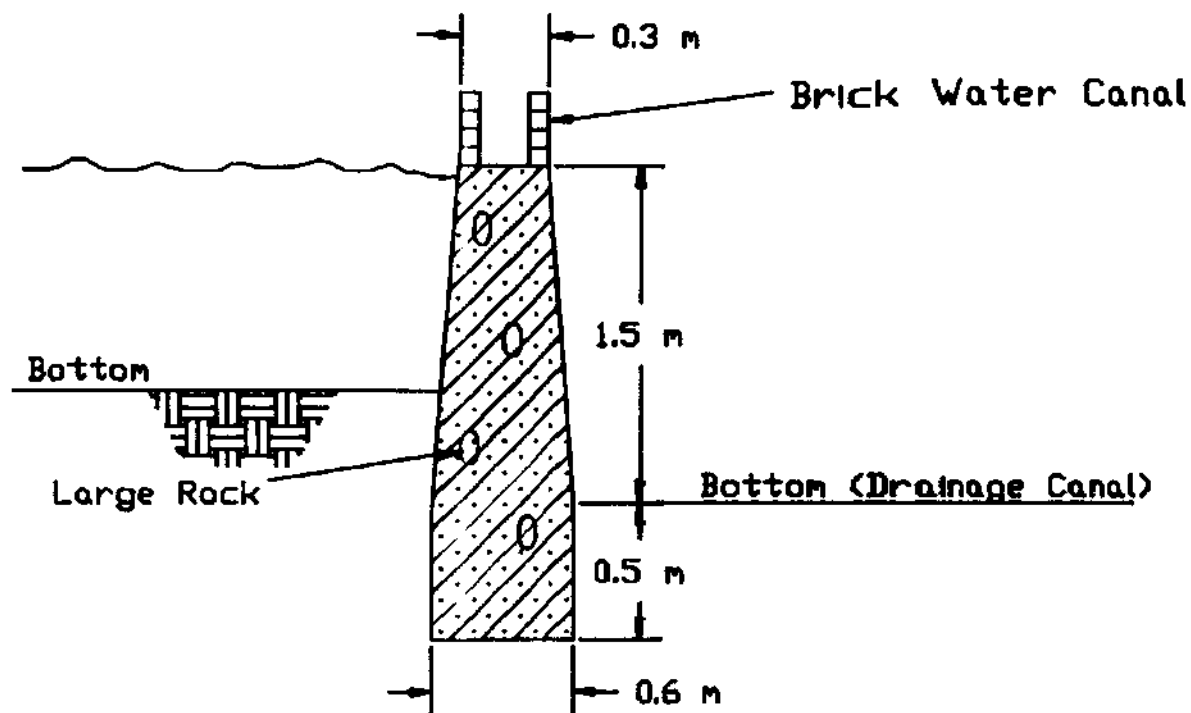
Cross-section of concrete walls at farm 10. Wall contains large rocks, but no iron reinforcement. Water canal is on top of wall.
